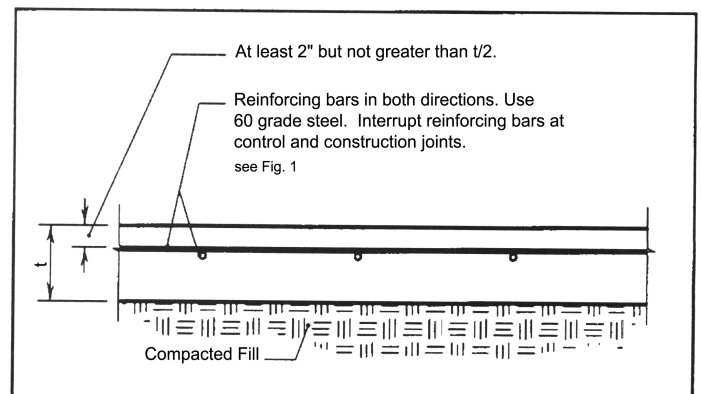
Mixing/loading pad structural design. See Table 3 for thickness and steel reinforcement requirements.
